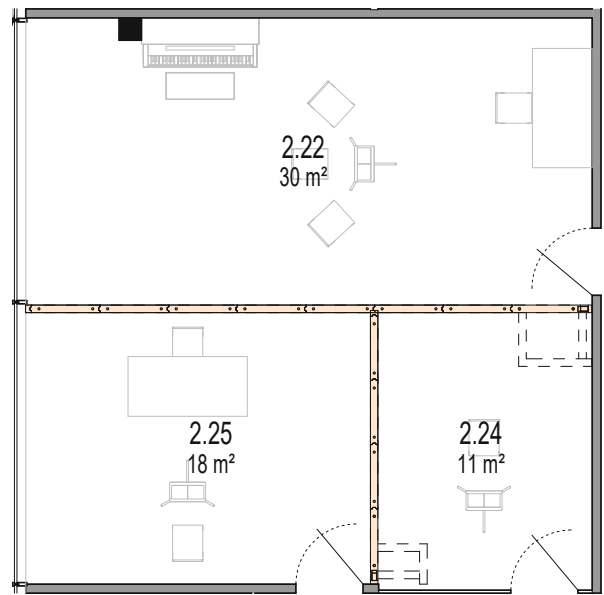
Flexible classrooms with closed moveable walls-floorplan
